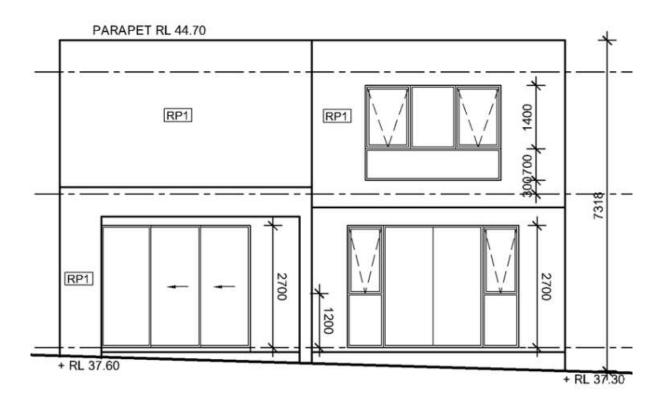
Rear elevation of the proposed dwelling house (source: N Lycenko Architect, dated May 2020)
